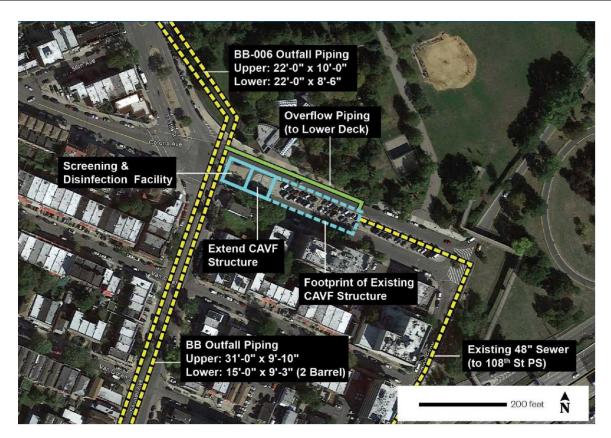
Layout of Alternative 9-2 - Re-purpose the CAVF as a Retention Treatment Basin
